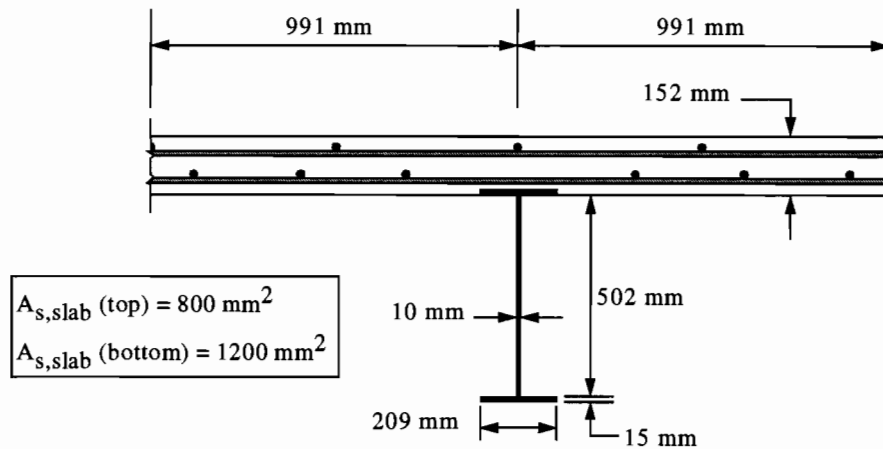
Details of a Typical Interior Girder Section in the Positive Moment Region of the Bridge Units.
